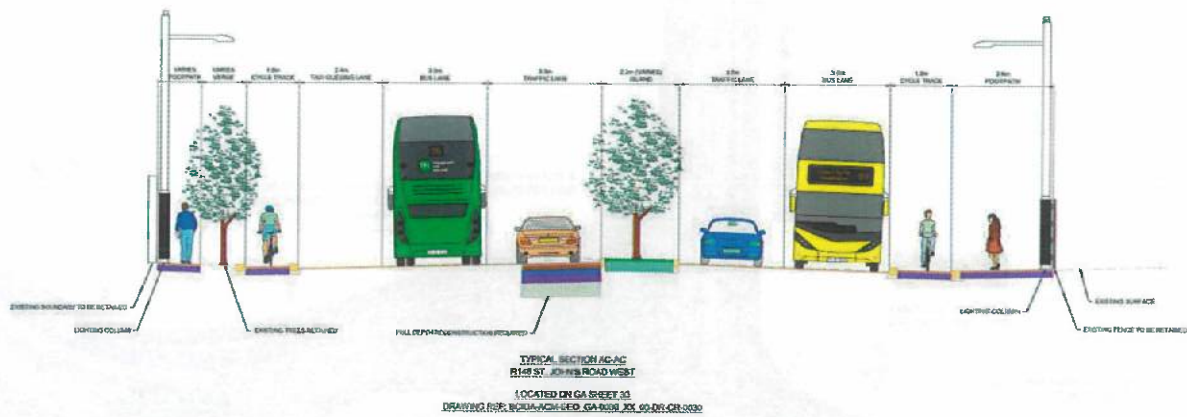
Cross section AC-AC: Excessive 3.3m lane proposed beside narrow 1.5m cycle lane and narrow footpath on St. John's Road West
